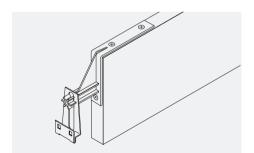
Securing the starter bracket onto the corner of the fascia
